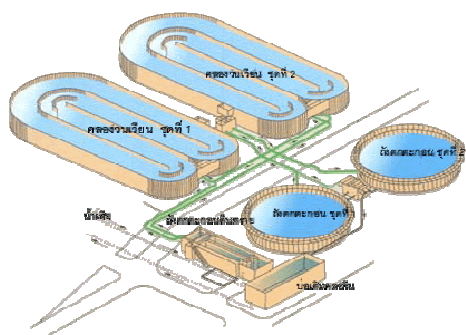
Layout of Typical Oxidation Ditch System in Thailand
